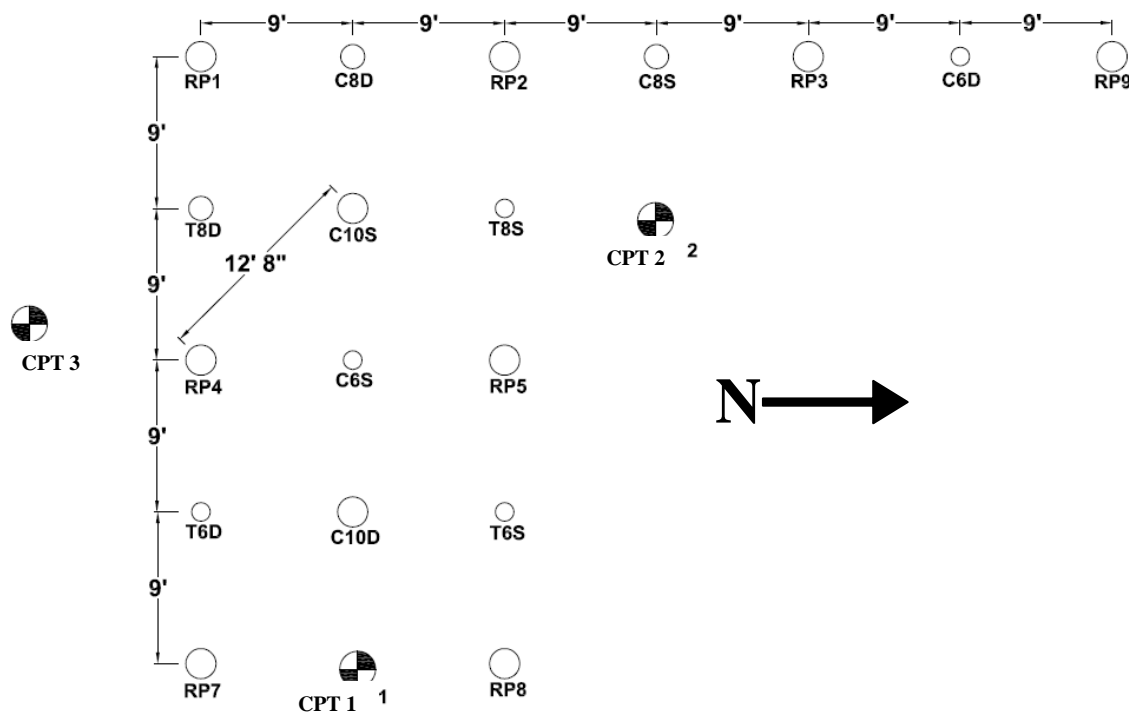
Lamont Test Site Layout – Pile Locations & CPT Soundings
